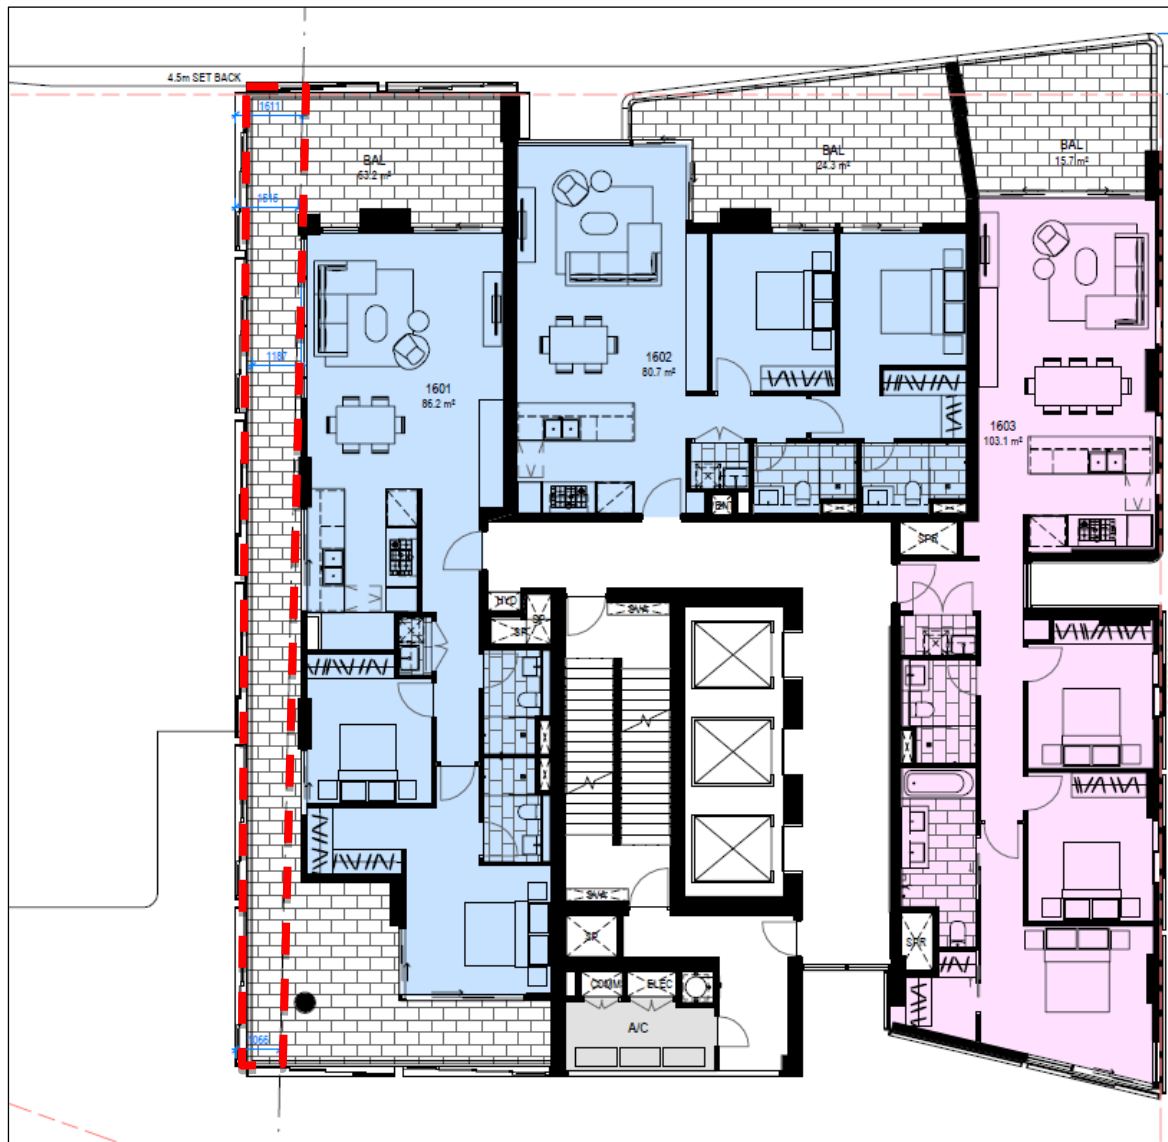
Typical Floor Plan Level 16 and above – Area of Height Variation (identified in red)
